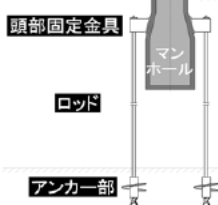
Typical example of design standard for installing manhole (<http://www.city.kobe.lg.jp>)
